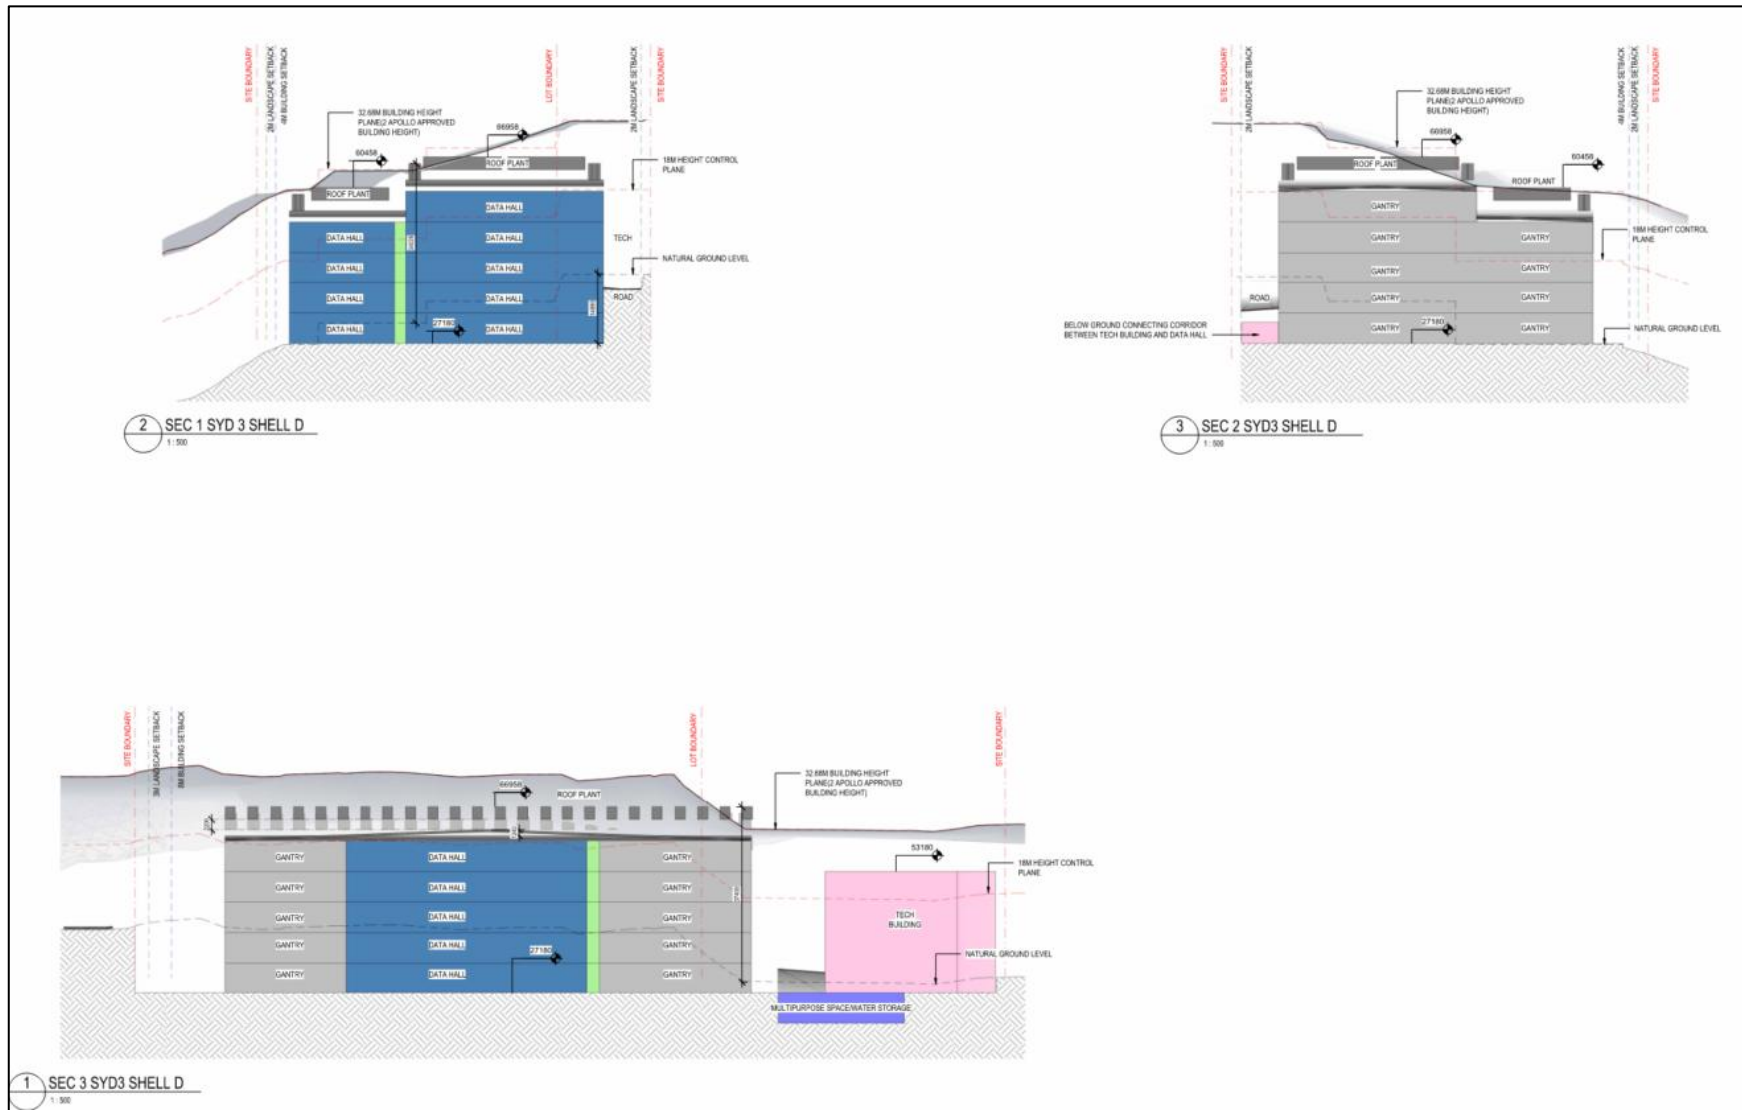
Concept Sections (Source: Greenbox Architecture, 2026)
